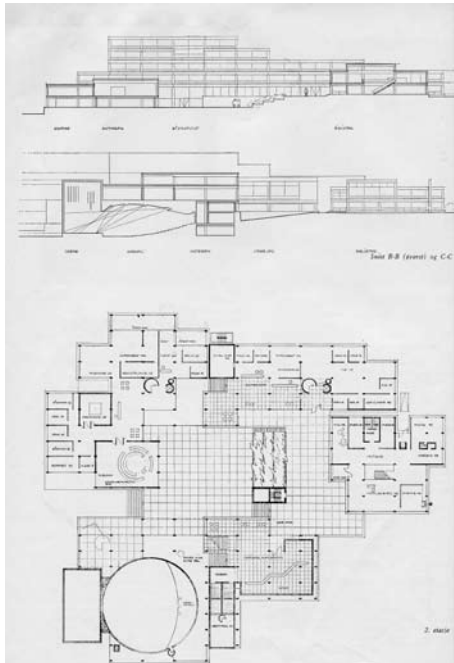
Main floor plan, Telje-Torp-Aasen.
